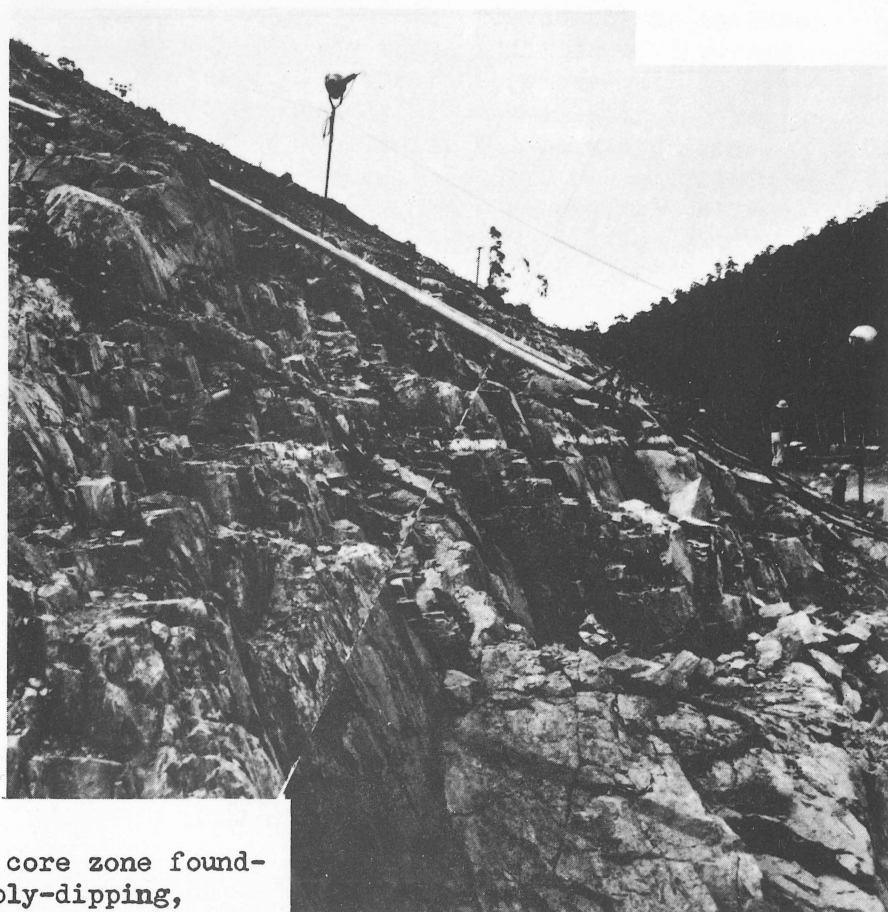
Typical core zone foundations in the steeply-dipping, interbedded sandstone and siltstone on the lower slopes of the west bank.
